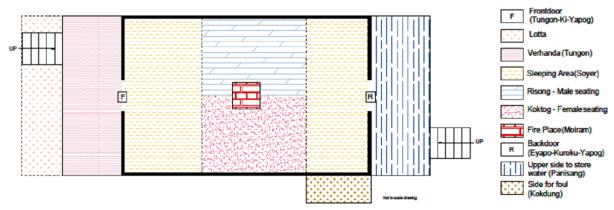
Layout plan of Mishing house (Sarma A., 2000)
